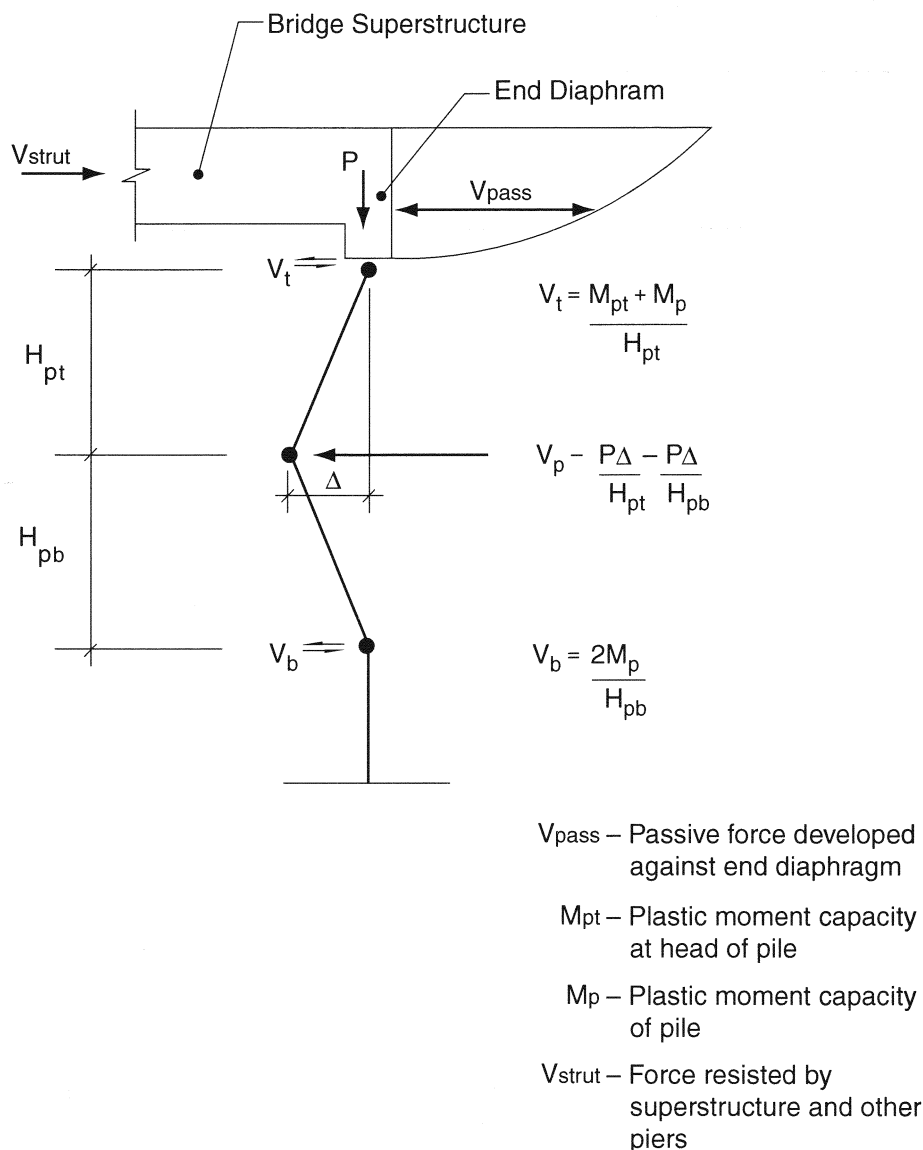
Plastic Mechanism for an Integral Abutment Supported on Piles
